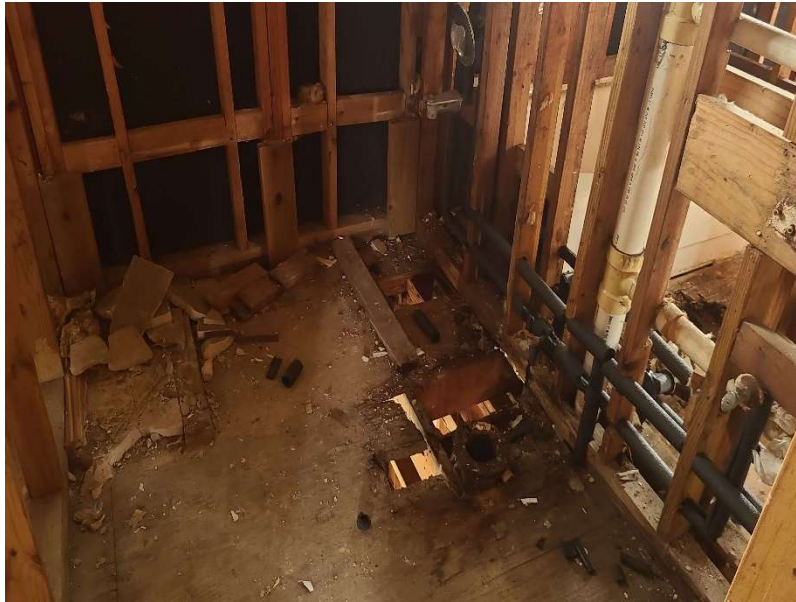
Rotten plywood and framing members below in upstairs bathroom
